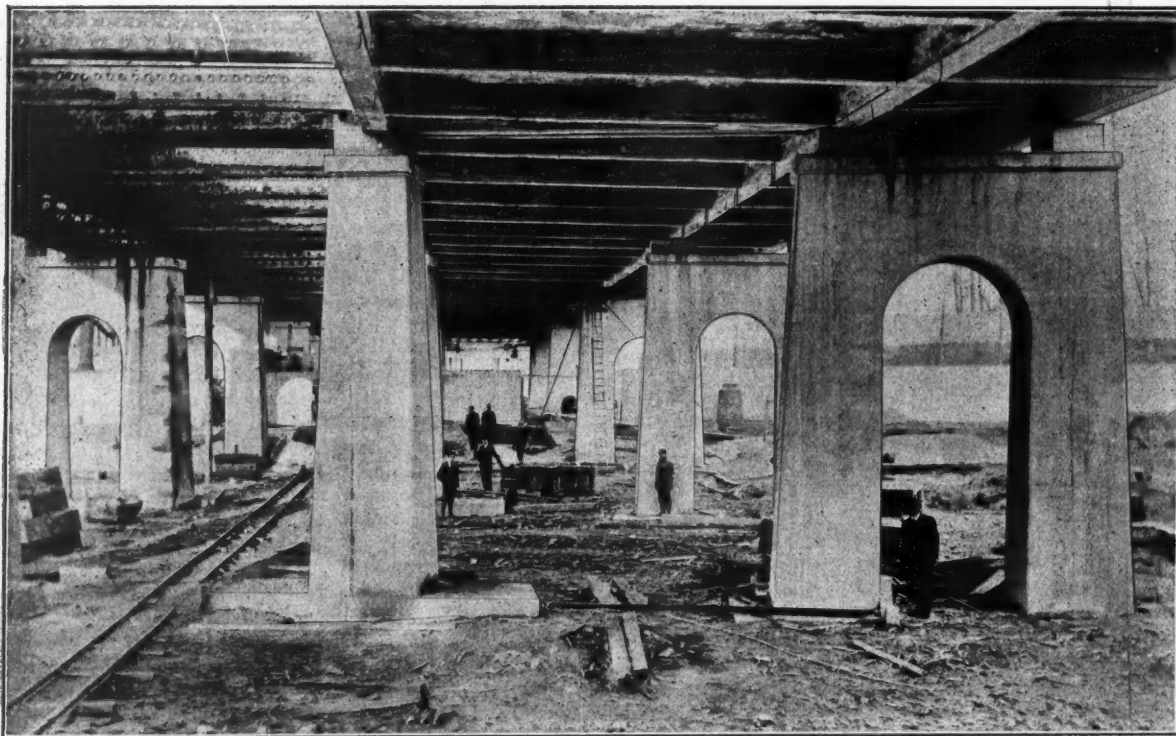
Steel Girders Encased in Concrete, Long Island R. R.
